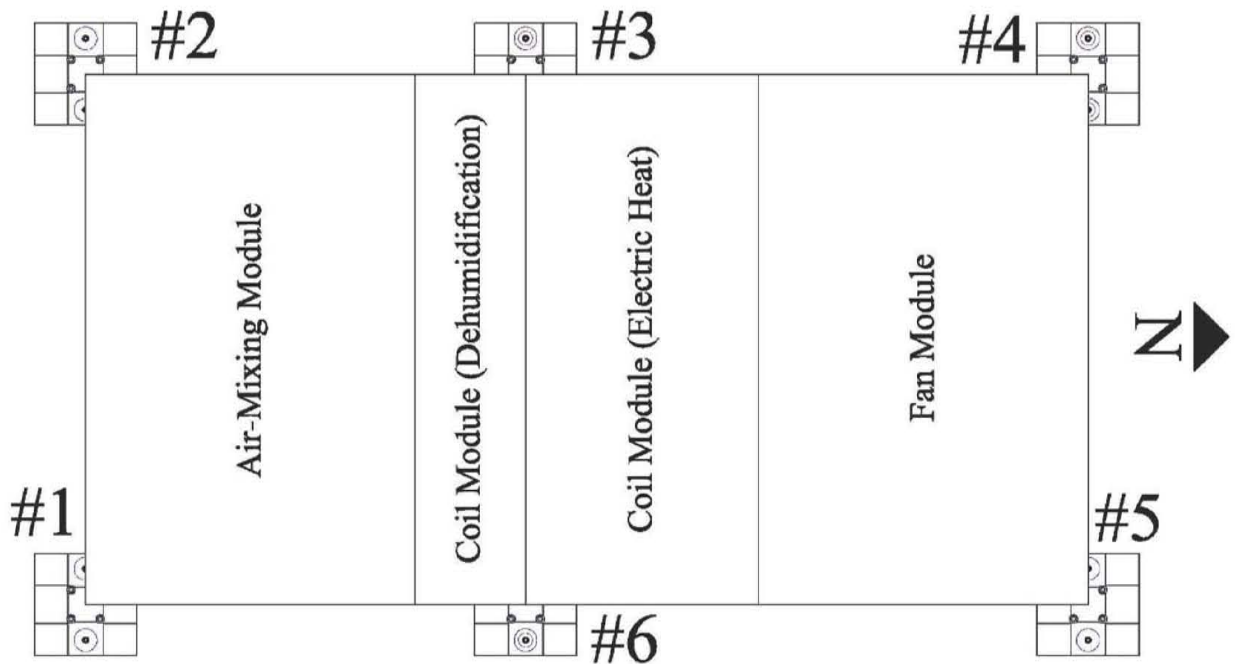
Arrangement of Six I/R Systems under Test Specimen
